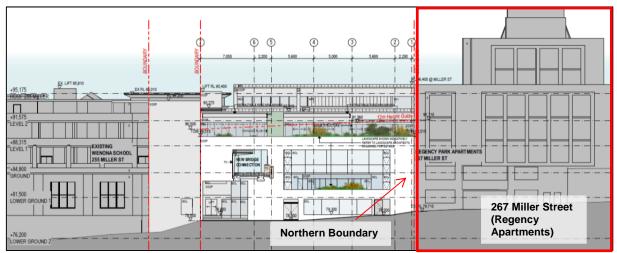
Elliott Street Elevation showing the proposed height consistent with existing streetscape (Source: EIS)
